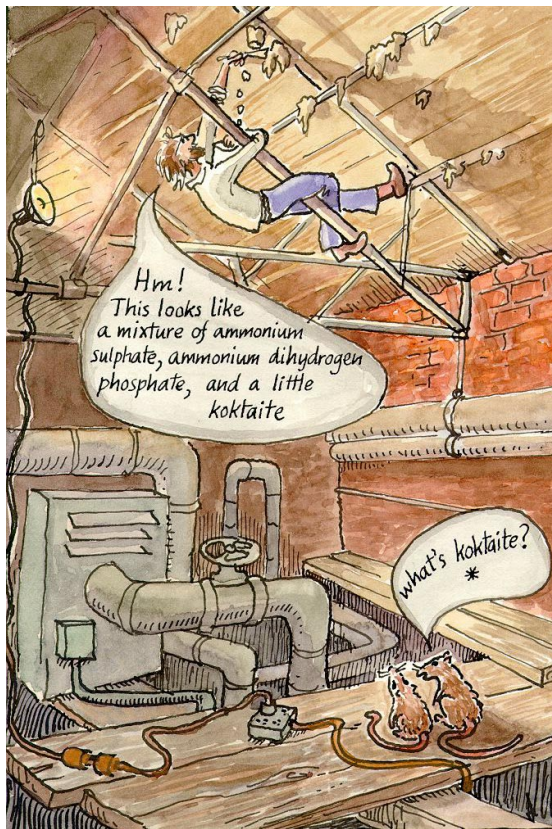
Fireproofing salts formed stalactites hanging from the ceiling panels, revealing that the water came from the roof. \*Koktaite is a hydrated calcium ammonium sulphate.
